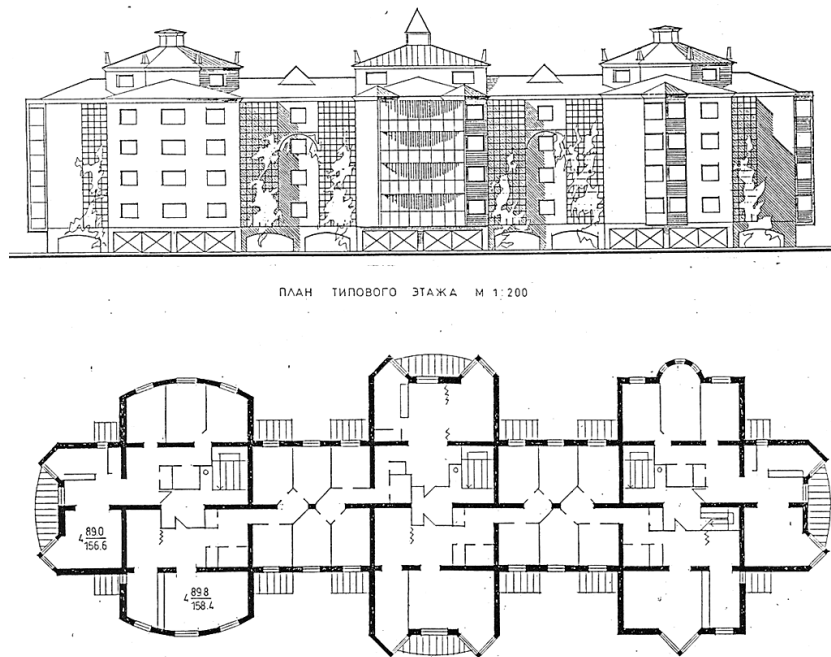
Floor plans and a facade of a residential building on Razzakov street.
